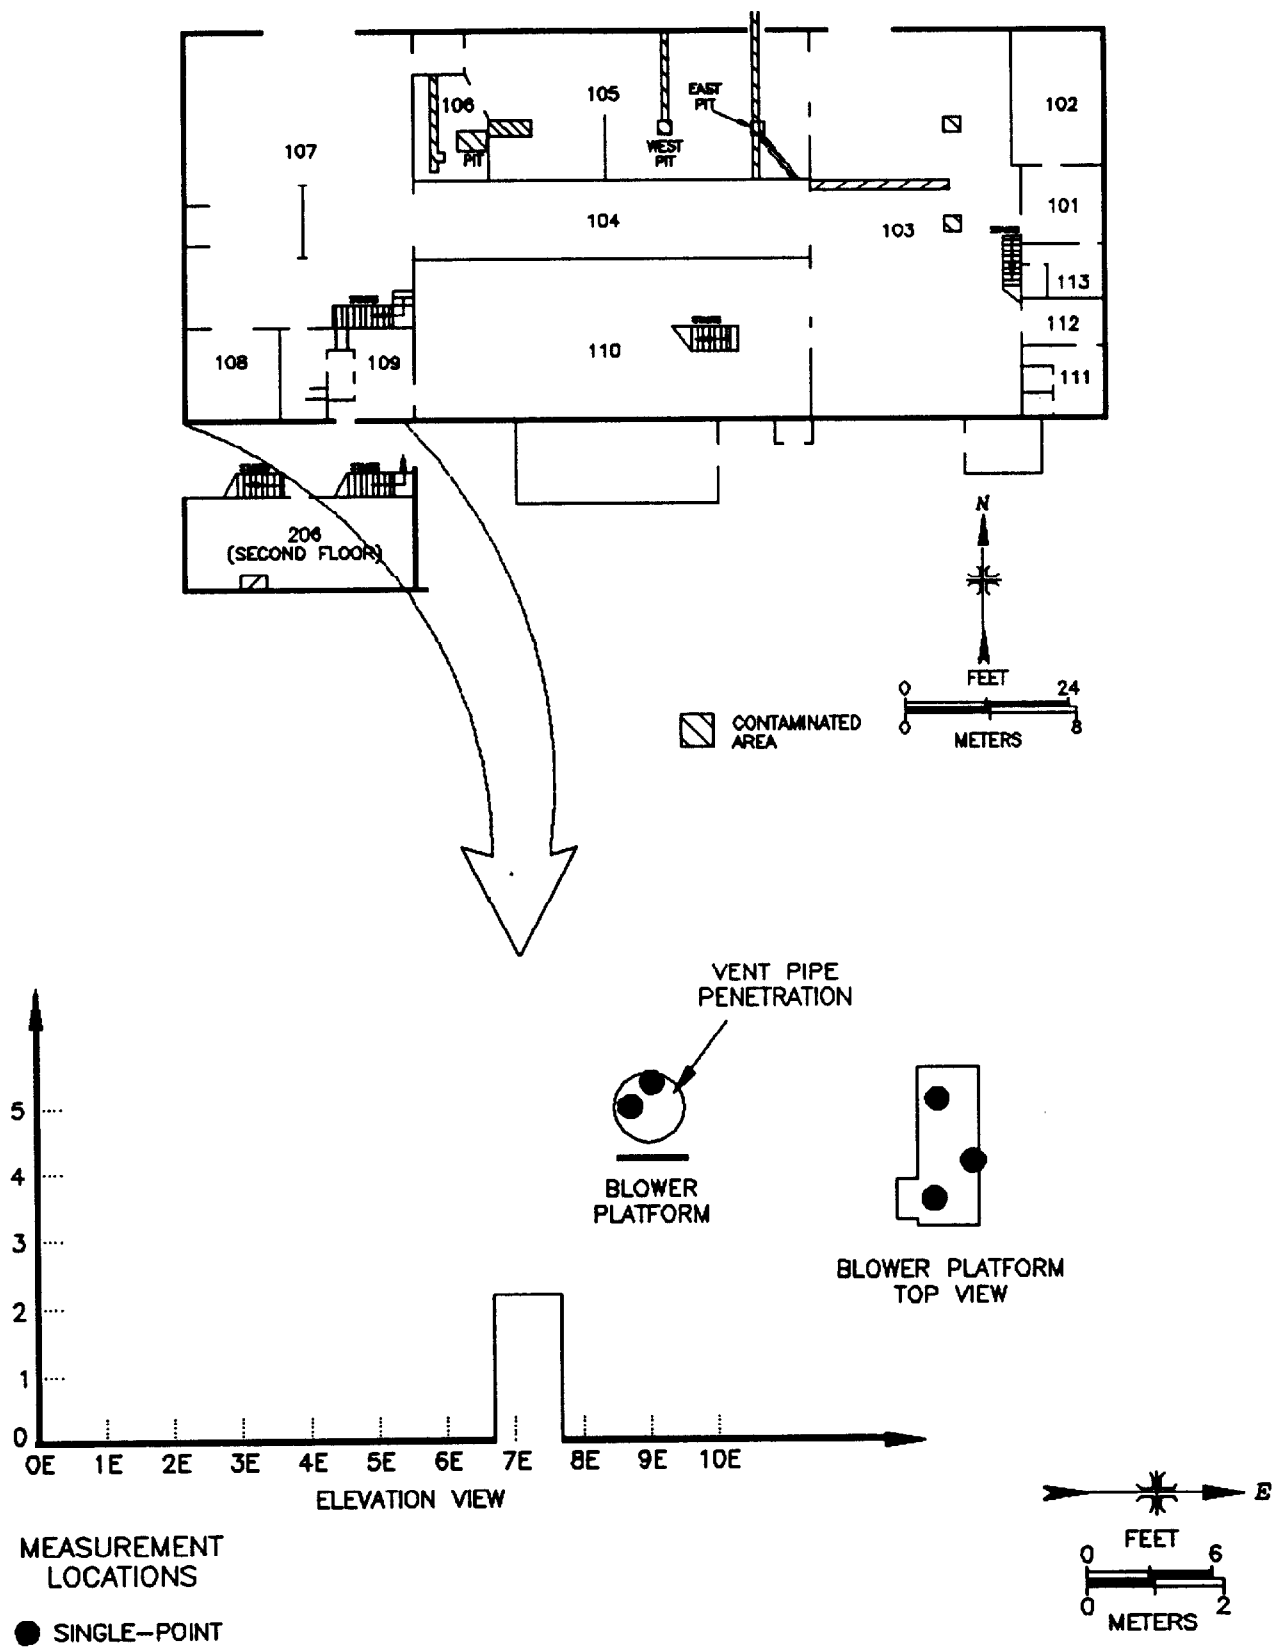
Building 4, Outside South Wall, Blower Platform – Measurement Locations
